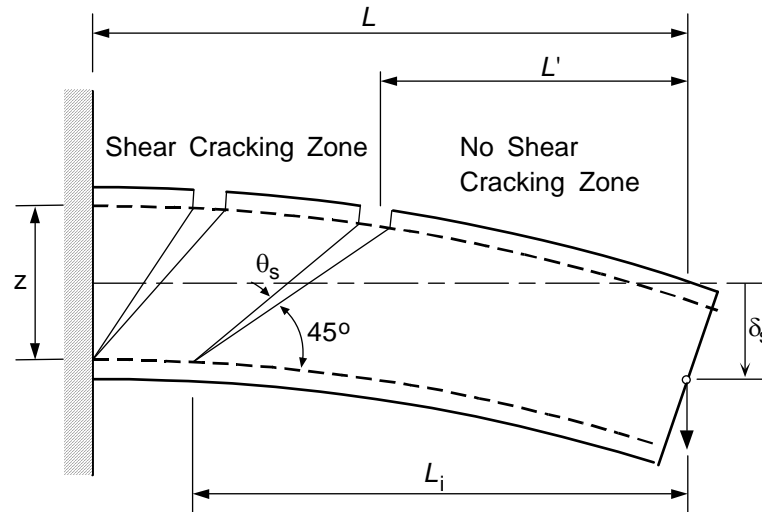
Park's Shear Crack and Shear Deflection Model (adapted from 5-5)
